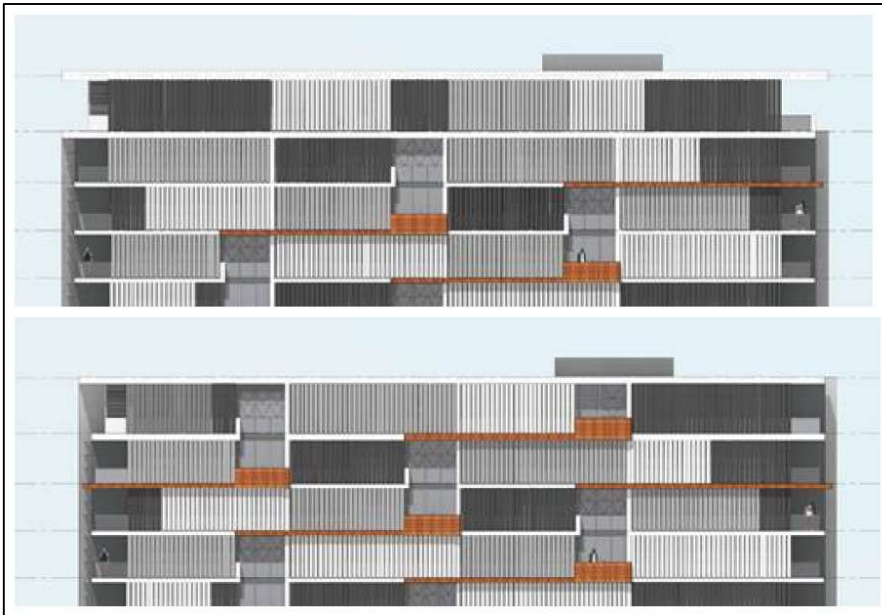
extract of western elevation comparing original plans (upper) to revised plans (lower)
